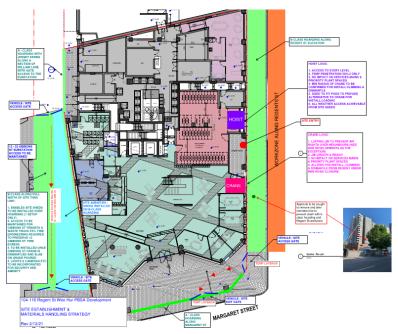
B - Tower Structure/Facade Phase Accommodation
